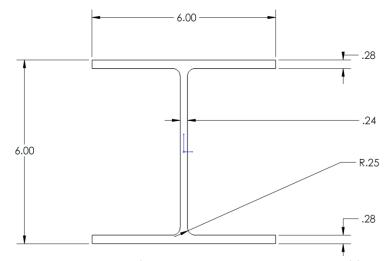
Cross-section of testing I-beam. Web is at center of flanges.
